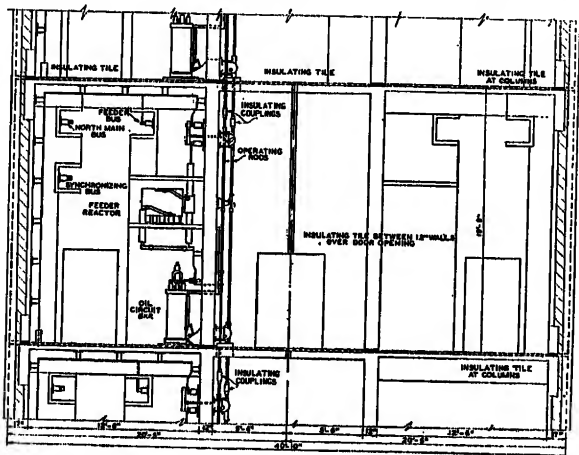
SHOWING INSULATION OF SECTIONS OF BUILDING
